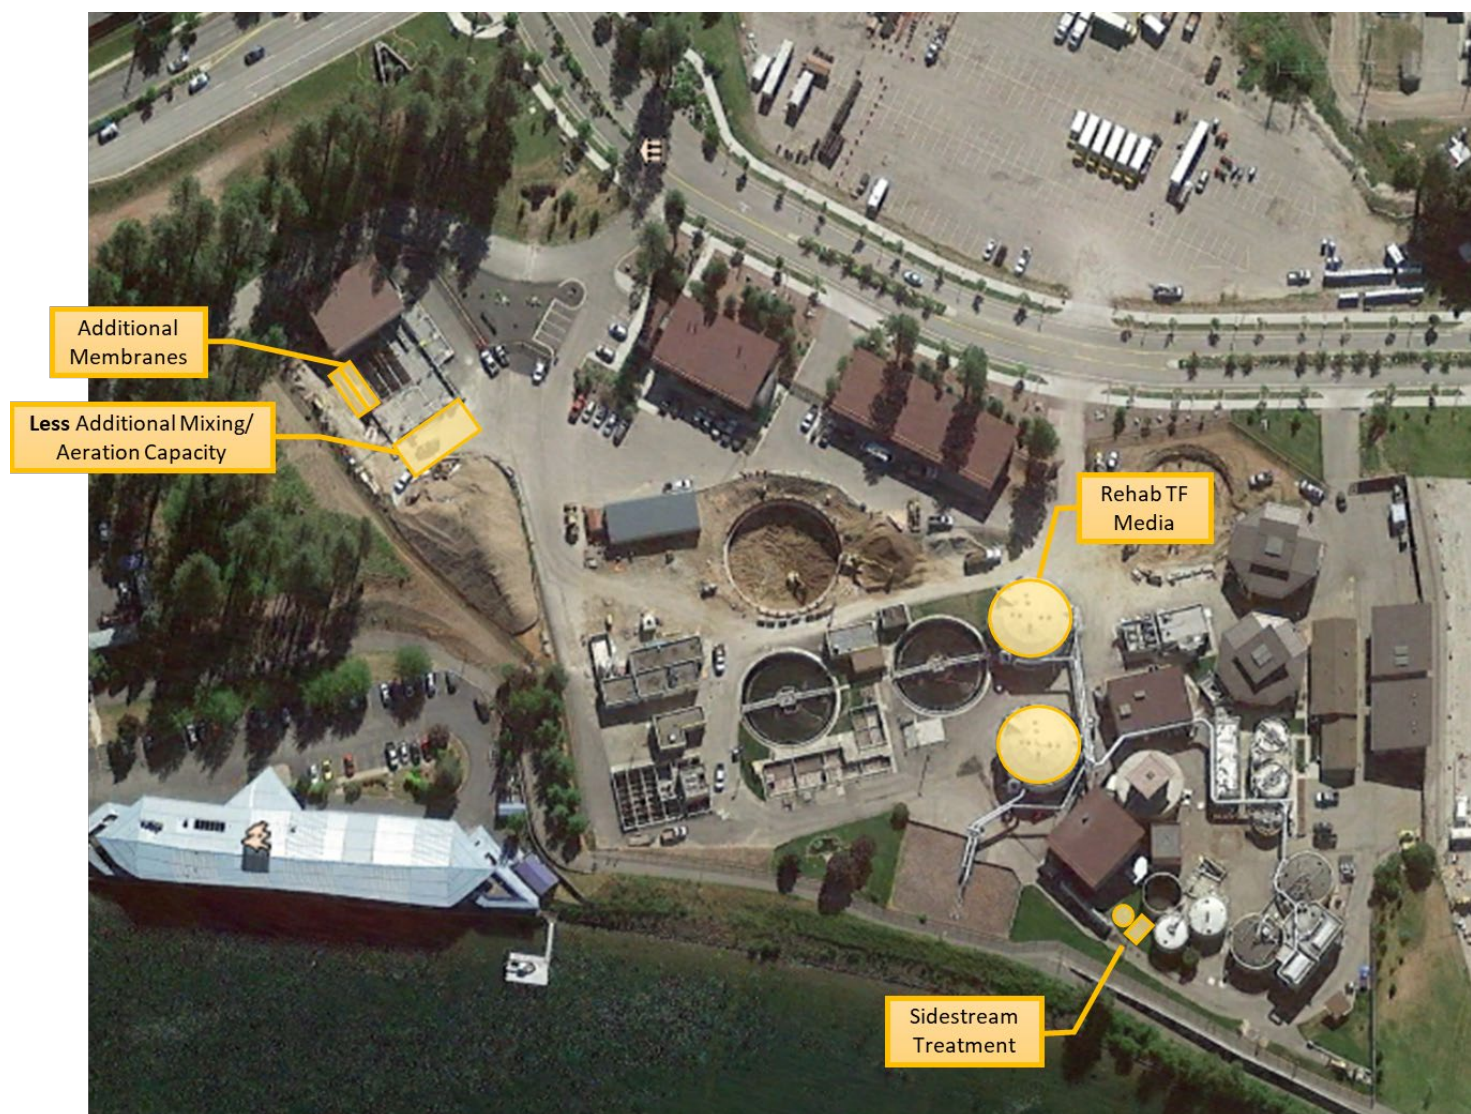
Site Layout for Alternative 3 - Expanded TMF with Sidestream Treatment
